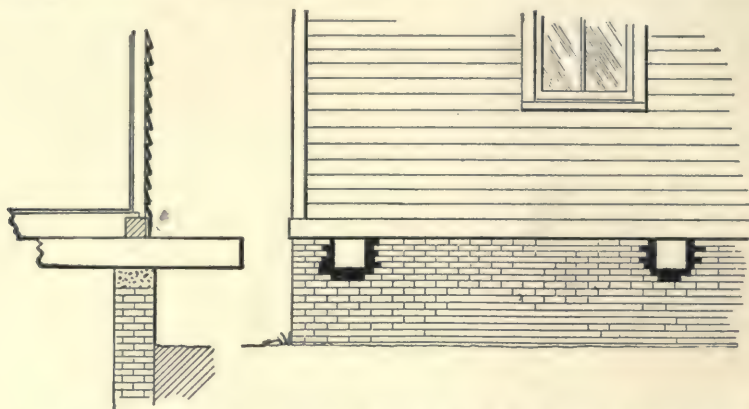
A Portion of the Under-Pinning of a House Showing Holes in Walls and the Manner in which the Timber is Placed.
